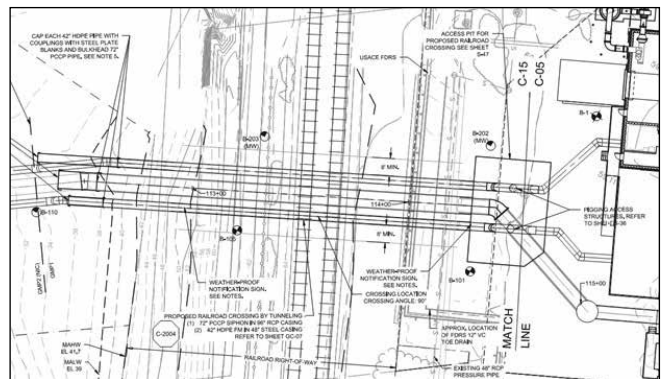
Excerpt from project plans showing trenchless crossing below FDRS and Amtrak Railroad
